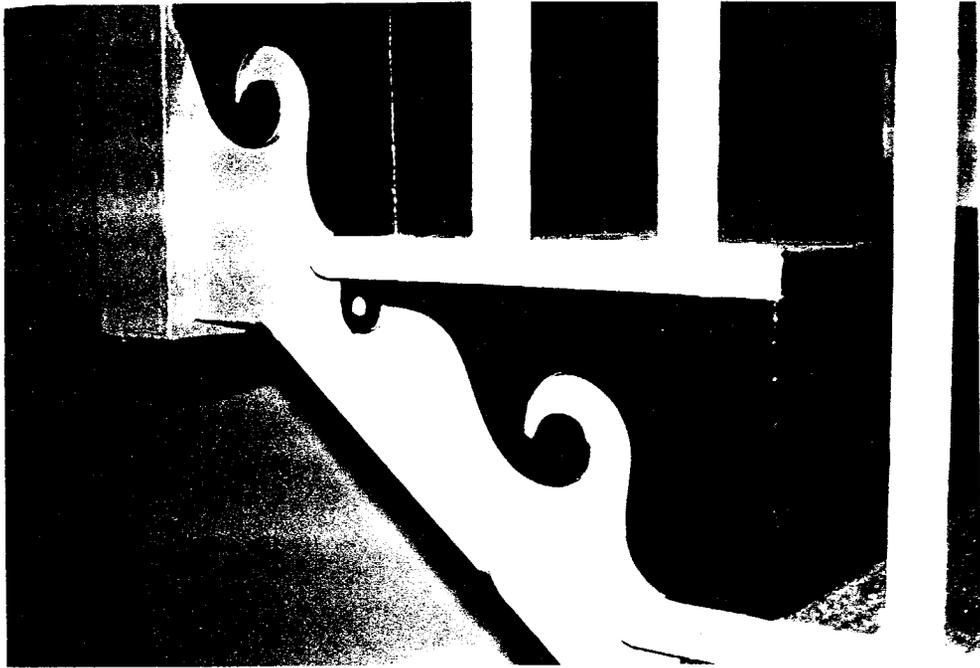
Mullen-Trout House, detail of main stairs (Neville)
